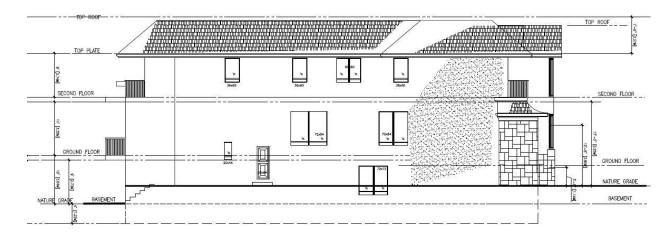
North Elevation of the development proposed for 347 Queen Street South. (Drawing by client, Jan. 2021.)
